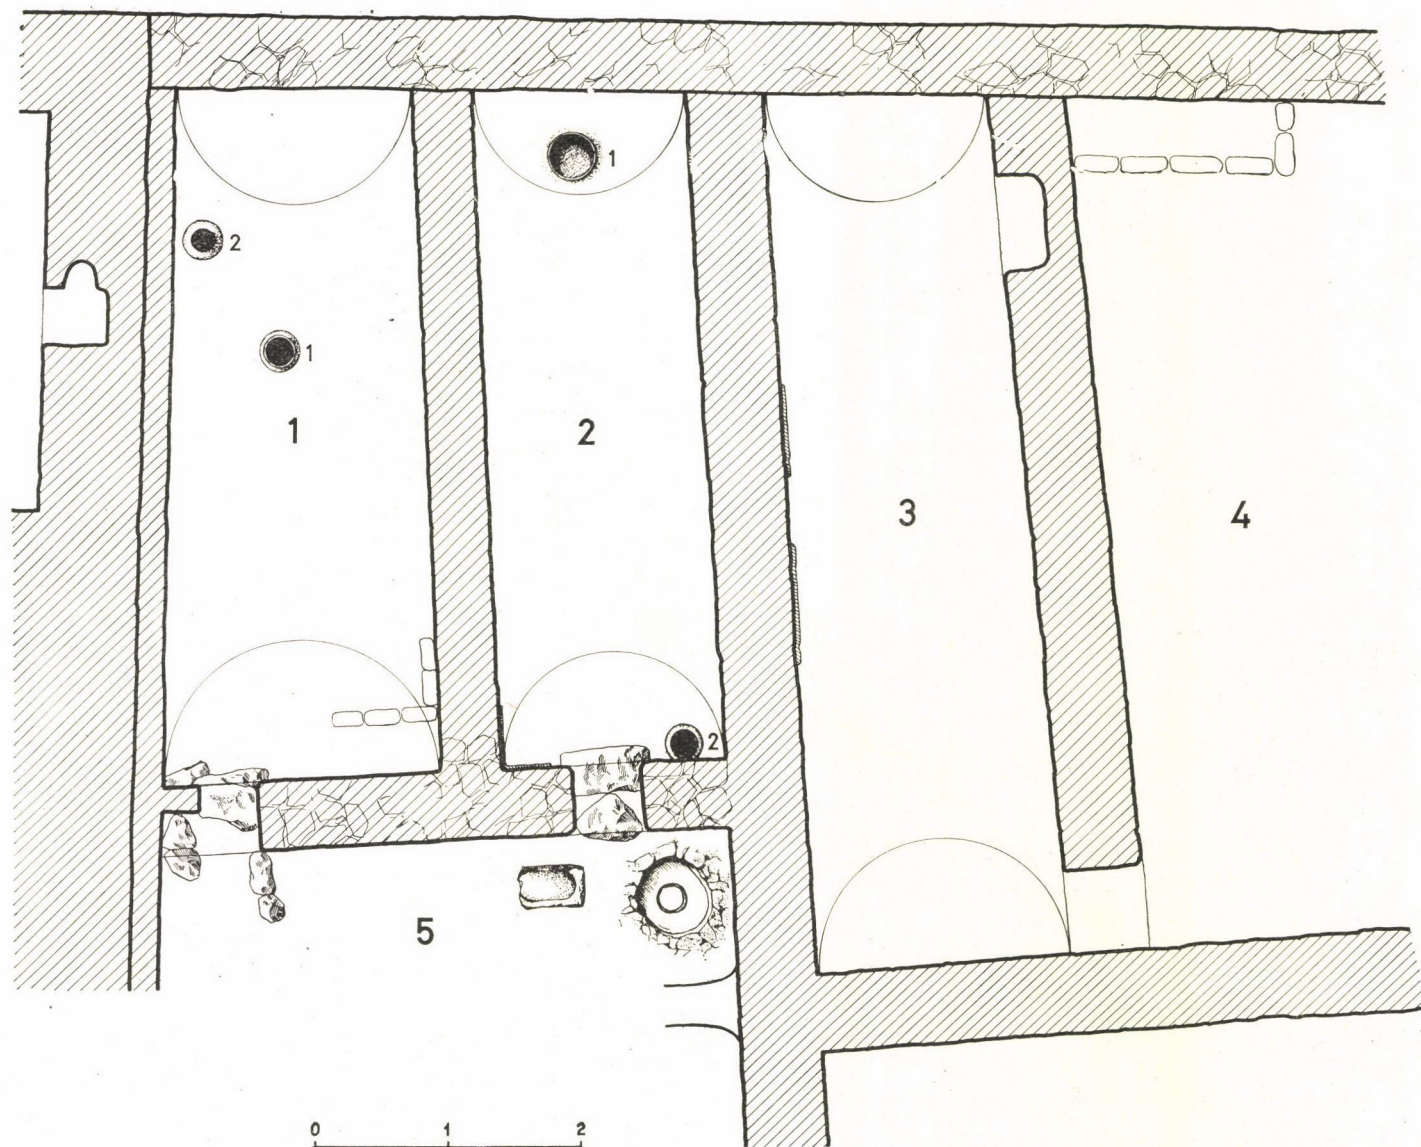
C/II, ground-plan of rooms Nos 1-5
